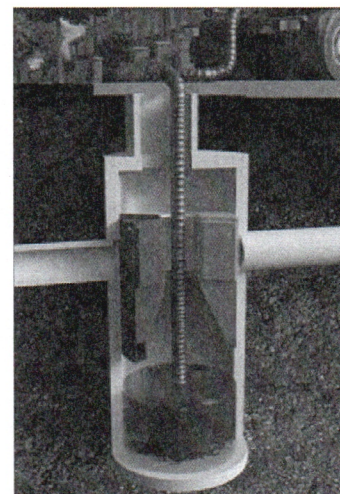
Sediment is removed with a vactor hose (First Defense model FD-4, shown).
